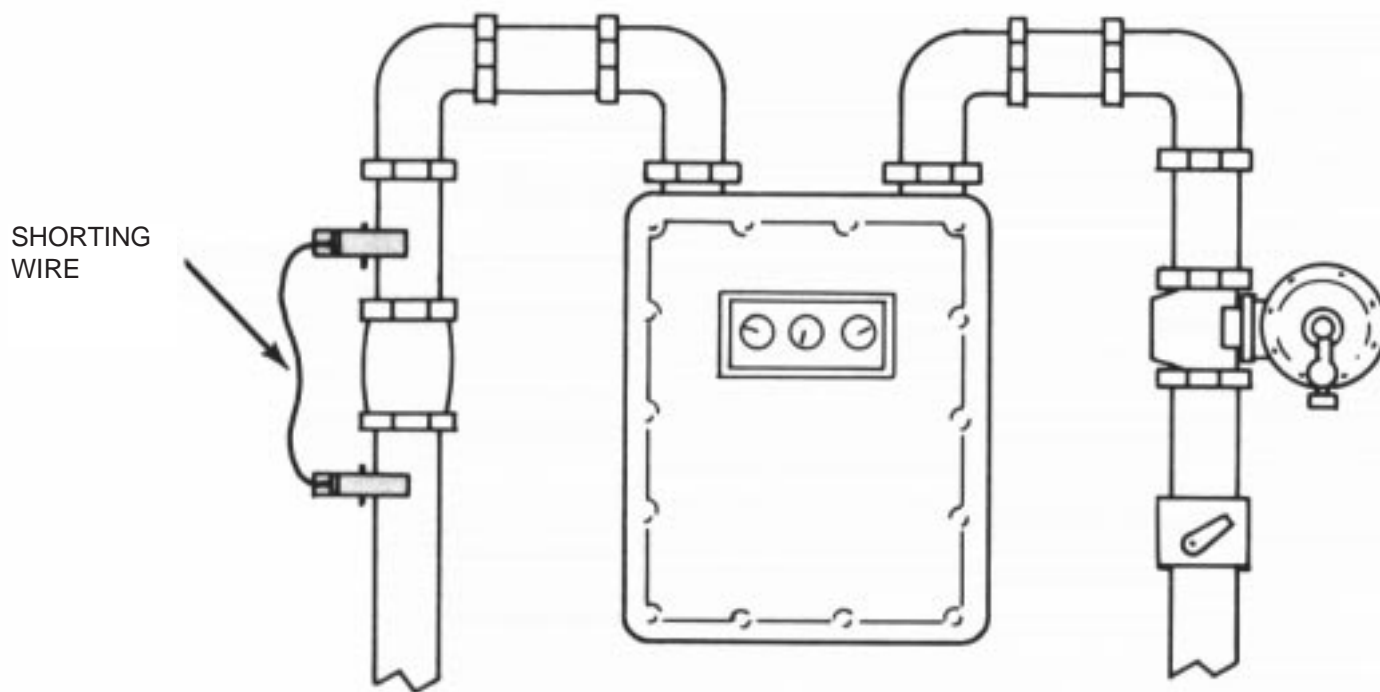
Shorting Wire in Place to Bypass an Isolator
